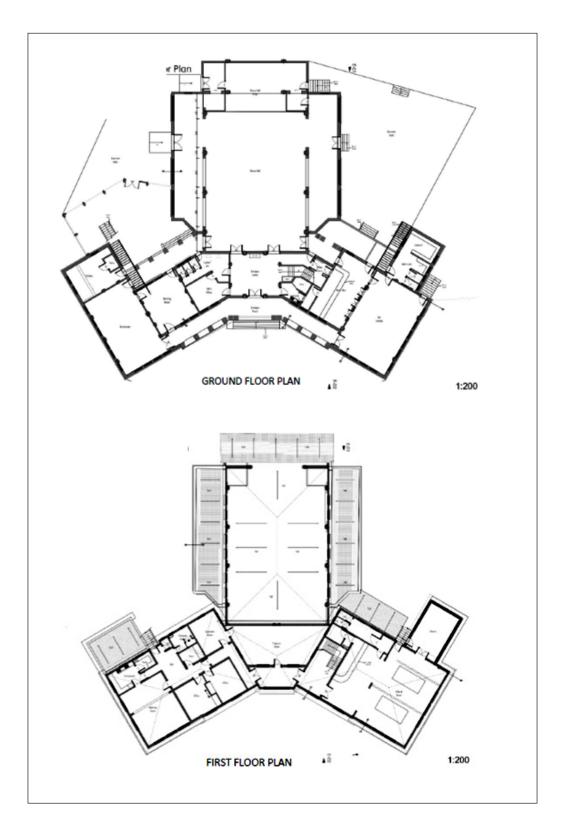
Nairobi Railways Clubhouse floor plans before demolition Source: Authors 2020
